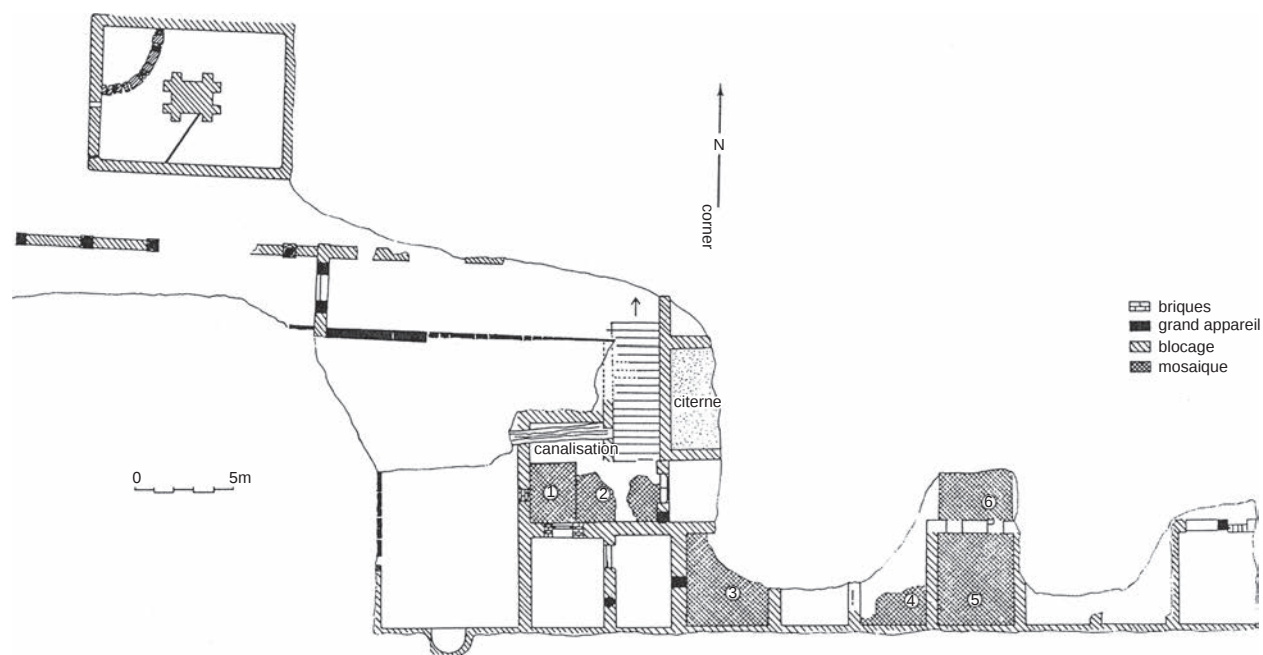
House of the Jonchée, room 5, Caesarea of Mauretania, plan, after R. Guery, in Ph. Leveau 1982, p. 111, fig. 1.
